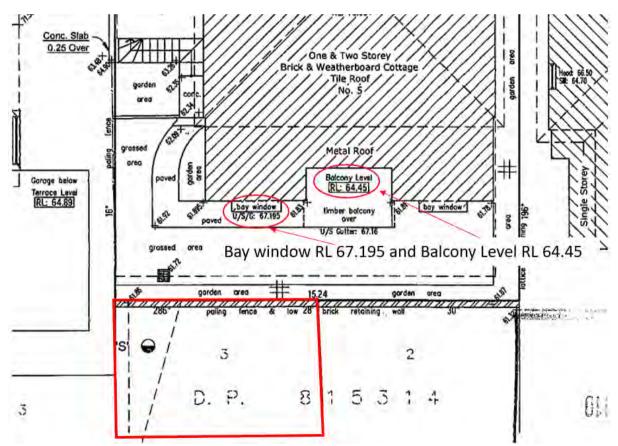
Annotated Survey Plan prepared by John R. Holt Surveyors Pty Ltd for DA 444/10 (never constructed) showing RLs of bay window and balcony providing views to the rear of 5 Balfour Street
